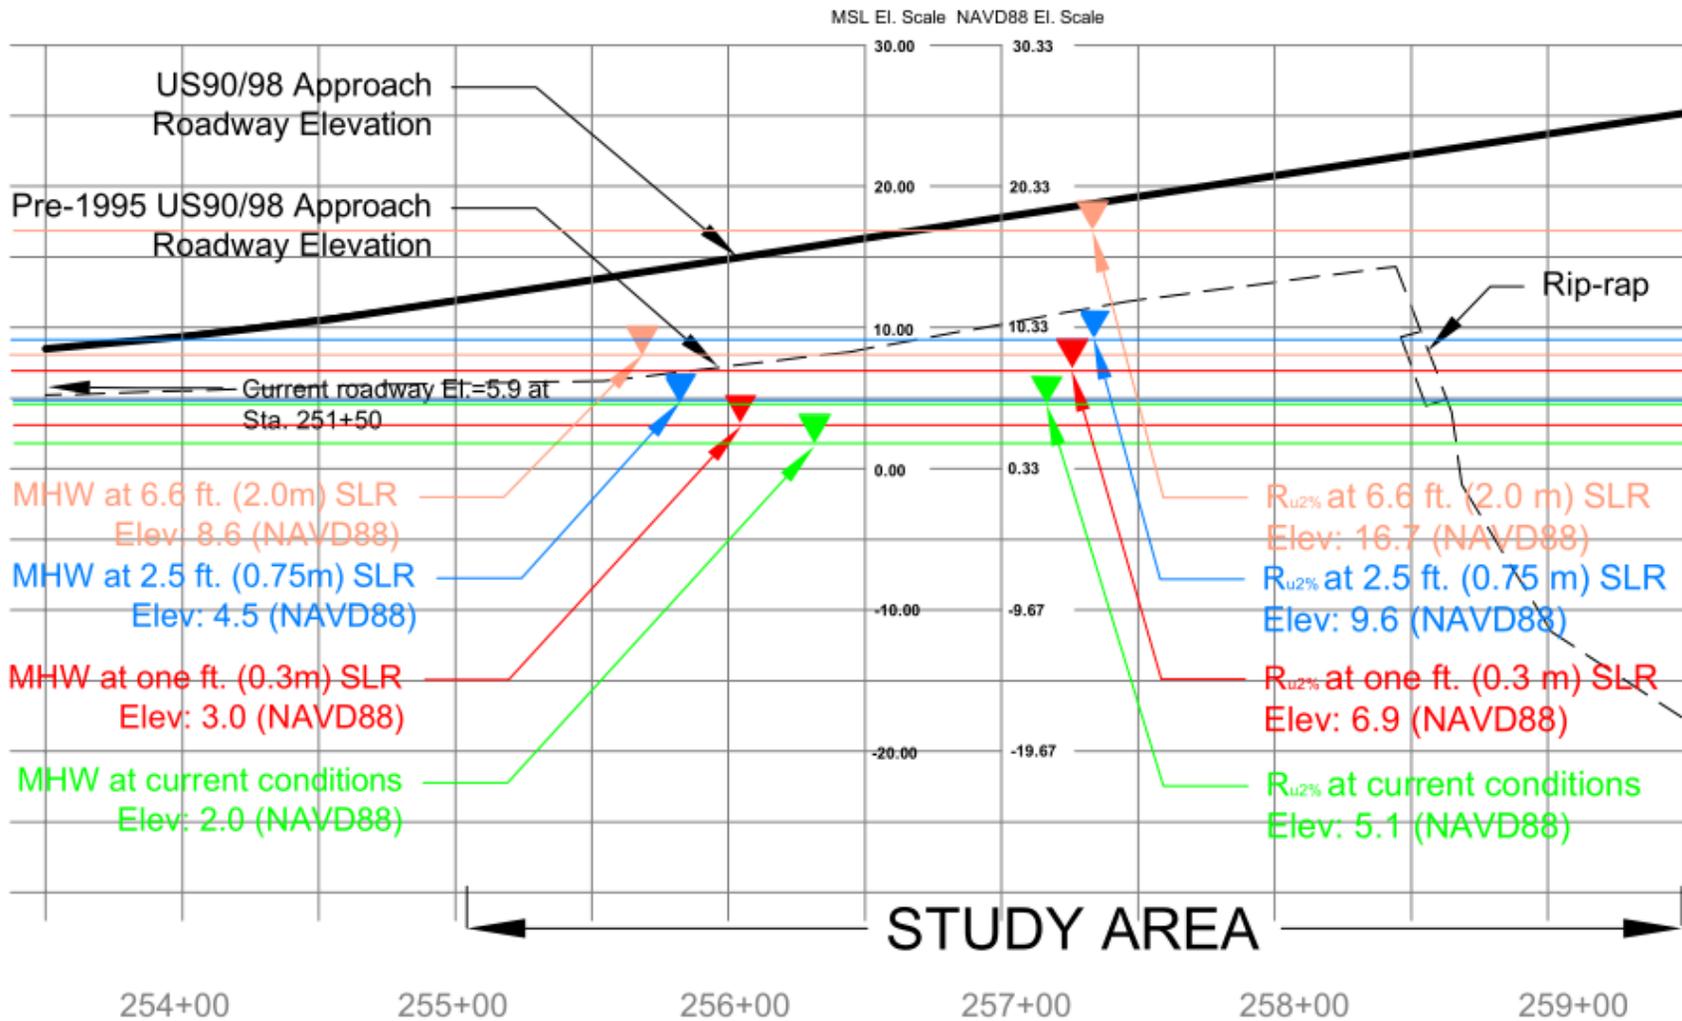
Profile of the US 90/98 Tensaw-Spanish River Bridge Approach Roadway and Western Embankment with MHW and 2% Run-up Water Levels<sup>165</sup>
